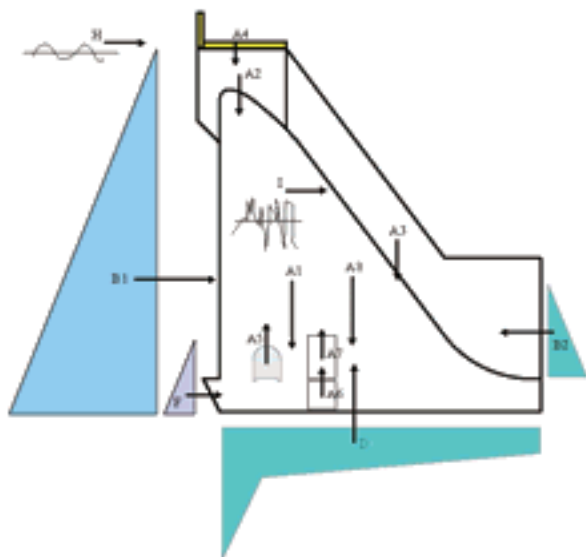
Calculation diagram of load combinations for dam surface outlets section at earthquake affairs
